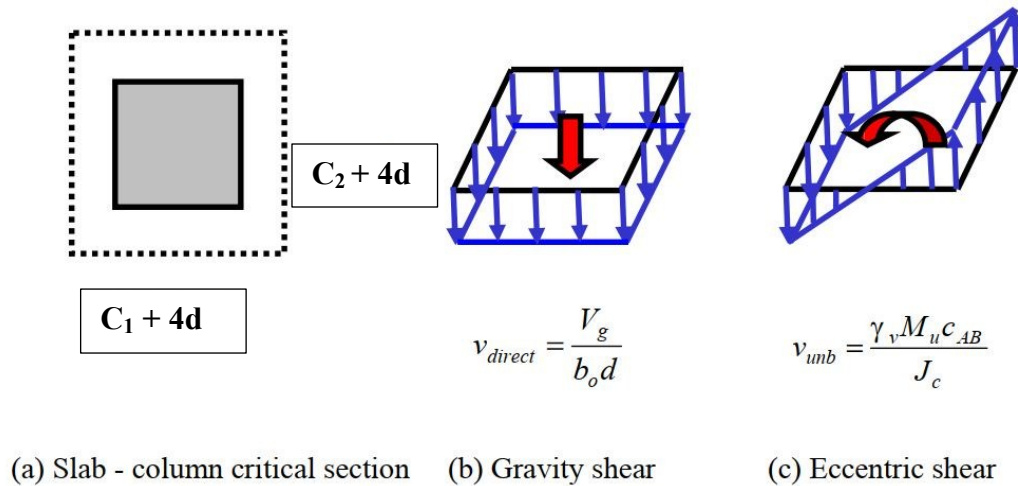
1 : Slab-Column Critical Section and Shear Stress Distributions (Kang, Rha and Wallace 2003)
